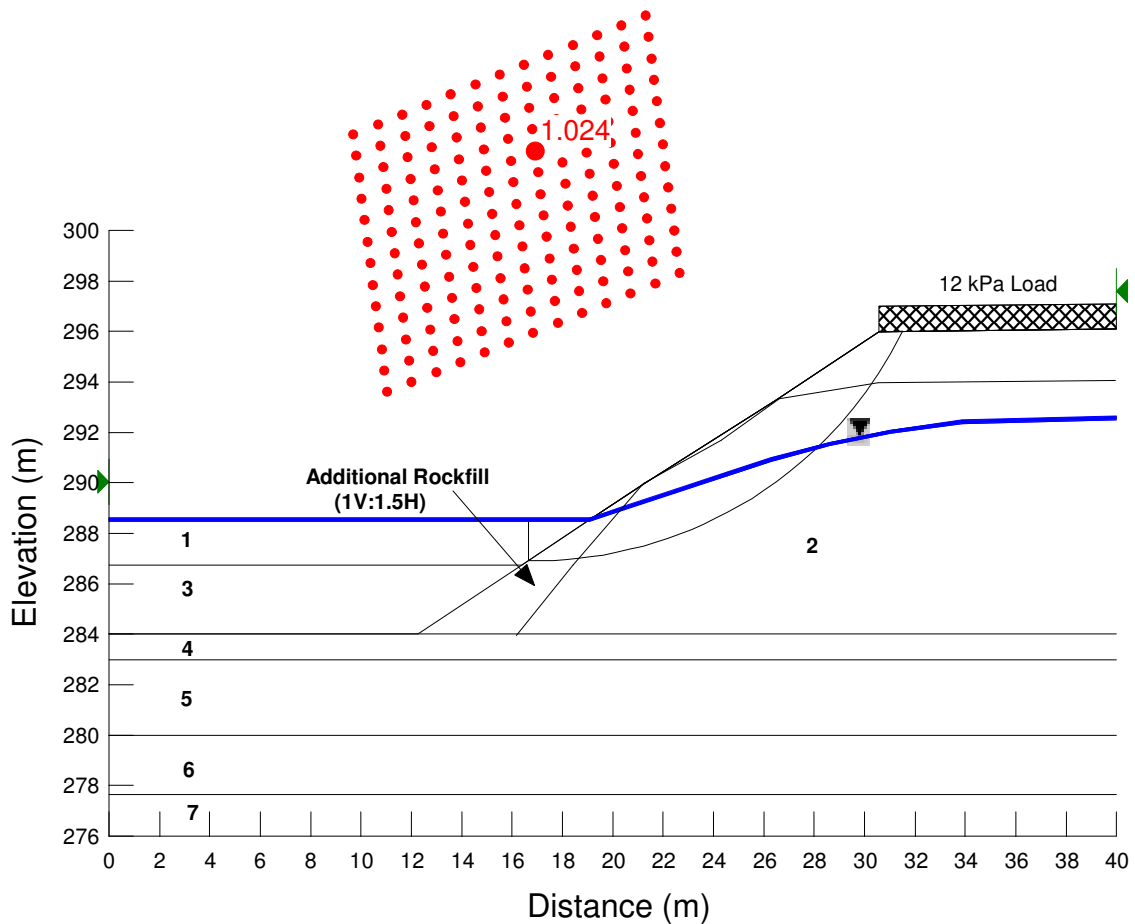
Stability of HWY11 Road Section at Sta. 14+800
